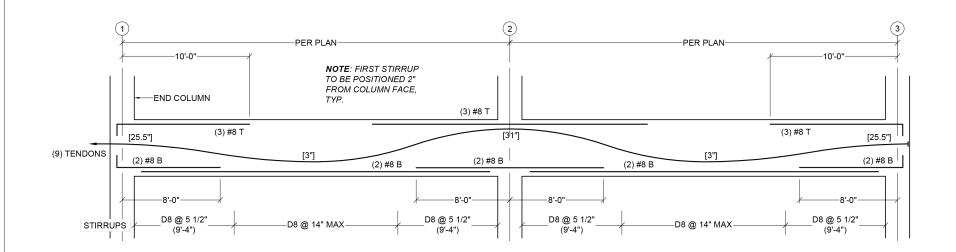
Engineer's beam elevation detail showing post-tensioning and mild steel reinforcement
